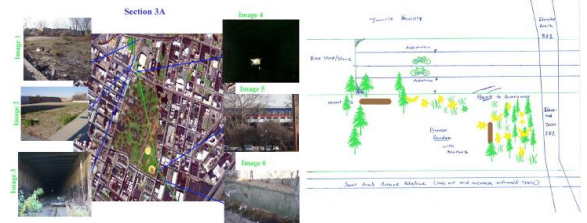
, Section 3A, is the site for a proposed garden with benches and tables for recreational use. Some stairs should be constructed to allow people to walk the greenway and go to the restaurants. Too many ramps are costly and should be used in places where people with wheelchairs and mothers with strollers could enjoy the greenway.
